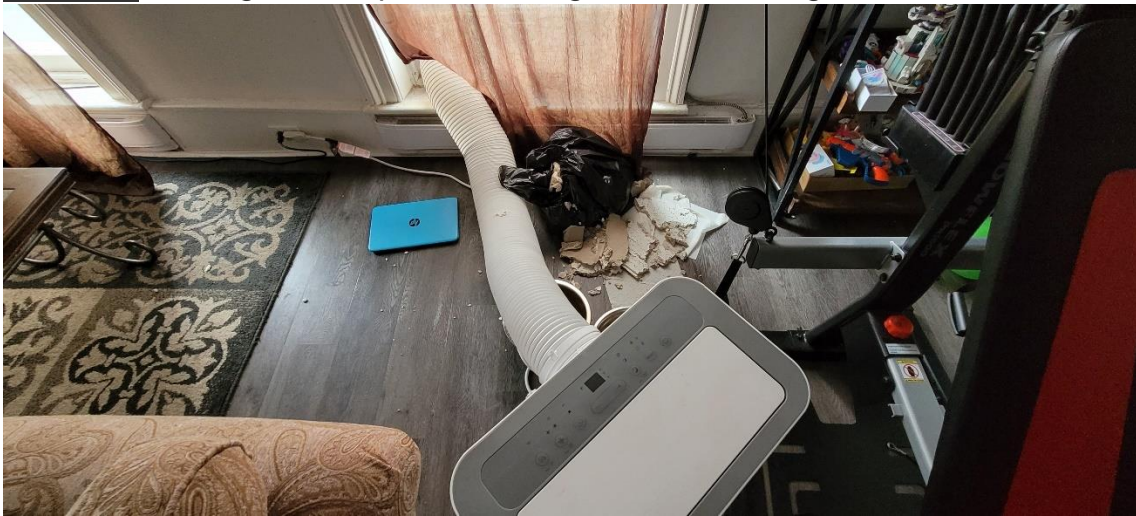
36 King St. W – photo showing roof leak damage on the interior with falling ceiling tile
